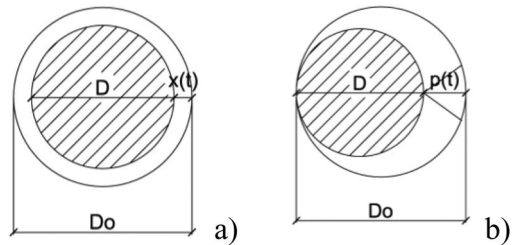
Reduction of cross-sectional steel area a) uniform corrosion b) pitting and uniform corrosion.
